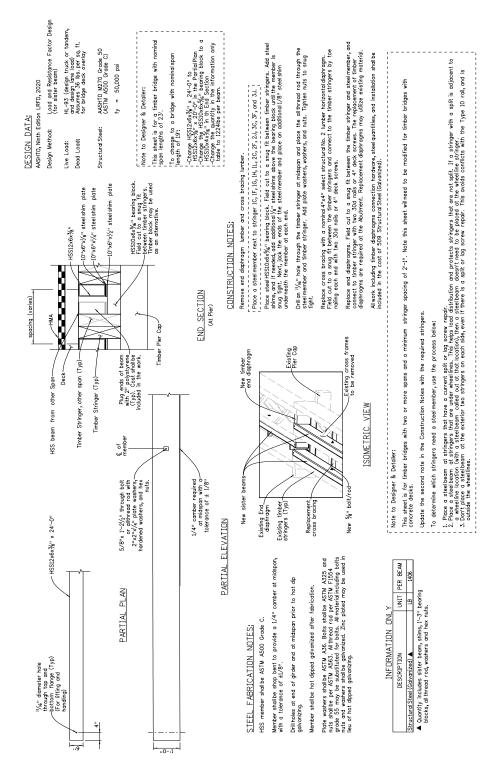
(H)-1 Current worksheet for Timber Girder repaired with Steel Sister Beam
